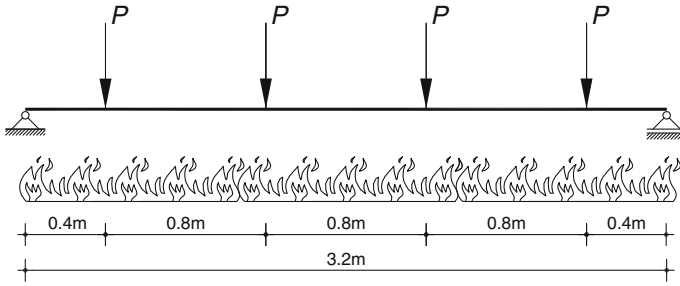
The test specimen and the arrangement of the loading (test No. 2 of [14]).
